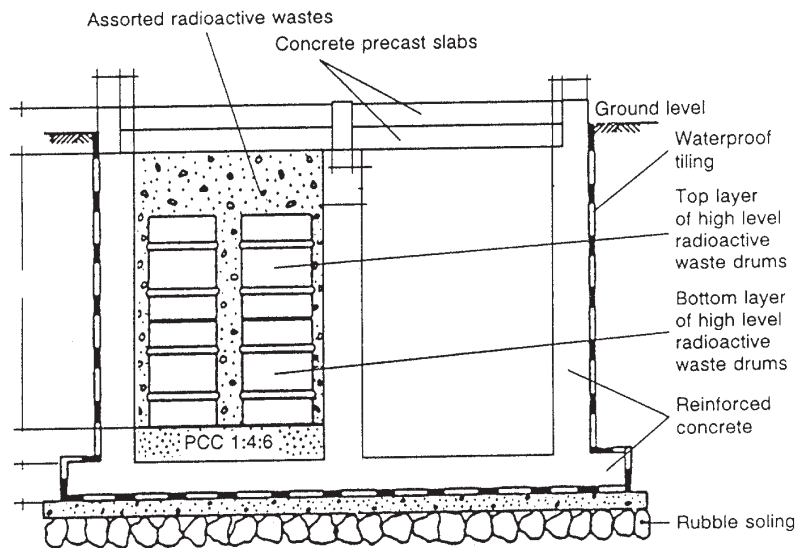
Typical cross-section of a reinforced cement concrete trench (PCC: precast cement concrete), Tarapur, India.
